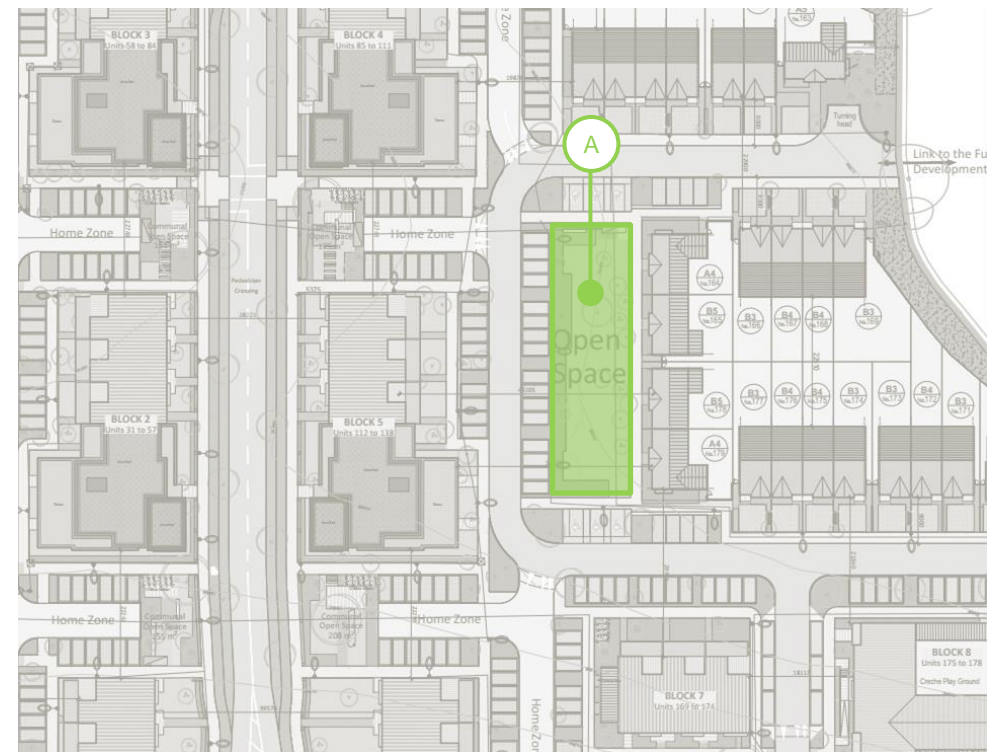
Plan showing the proposed outdoor amenity space assessed in this study
